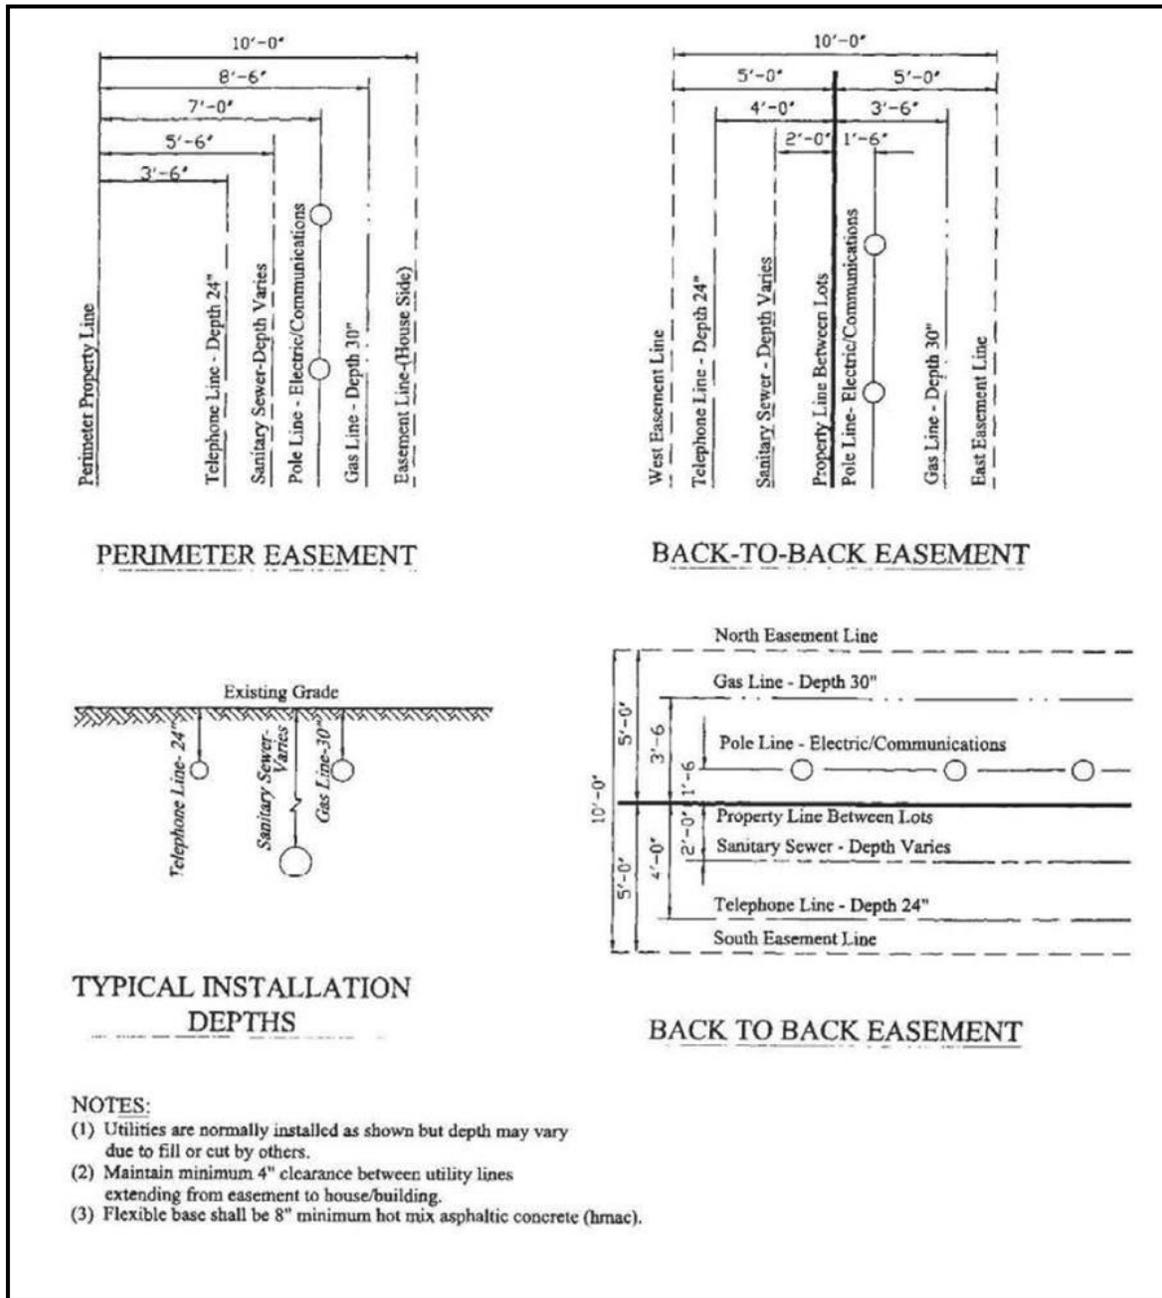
TYPICAL UTILITY LOCATIONS IN 10-FOOT WIDE RESIDENTIAL EASEMENT
